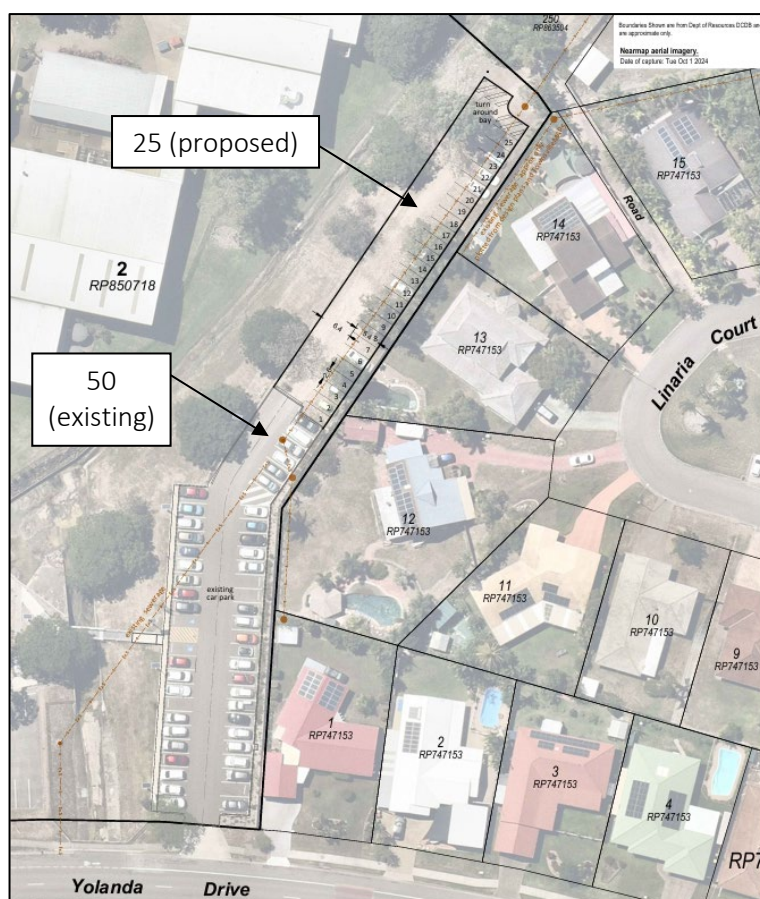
Existing off-street and on-street available car park spaces along Yolanda Drive
